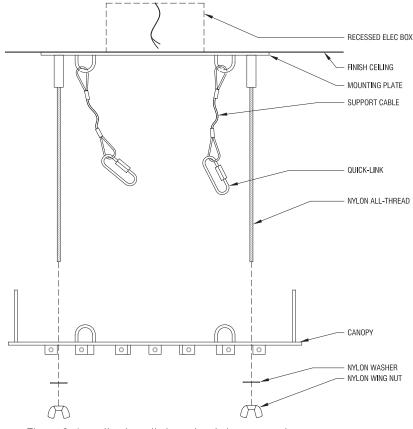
Install nylon all-thread rods into mounting plate and slide canopy up over rods
